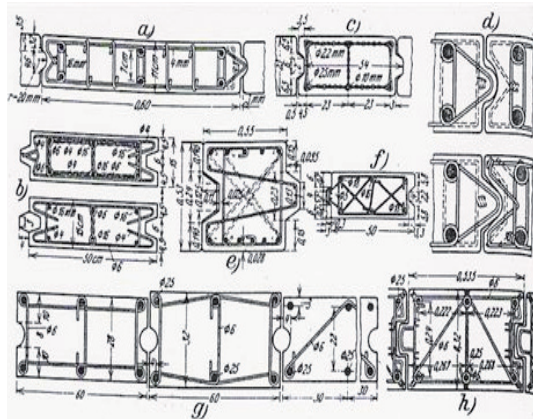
Cross-sections of different concrete wall panels [Leimdorfer 1976]
